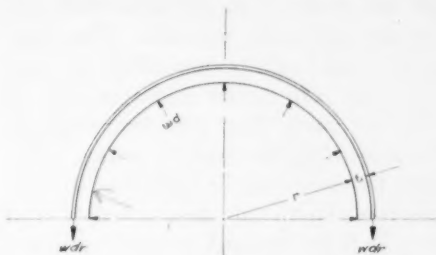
Half Plan of Horizontal Ring—1 ft. high
